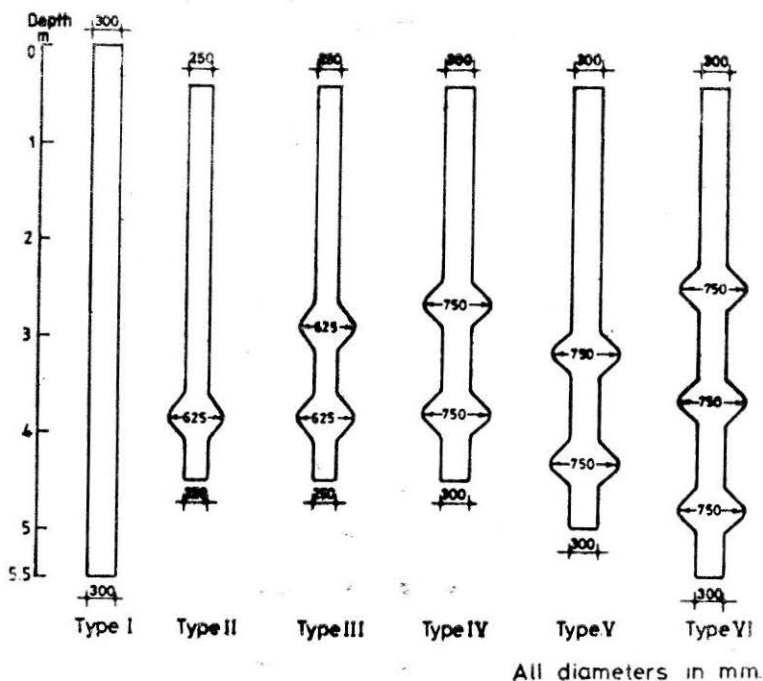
Details of Different Type of Piles at Deaf and Dumb School Site
